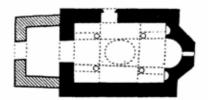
Vlachérna: Plan. Scale 1:200.
